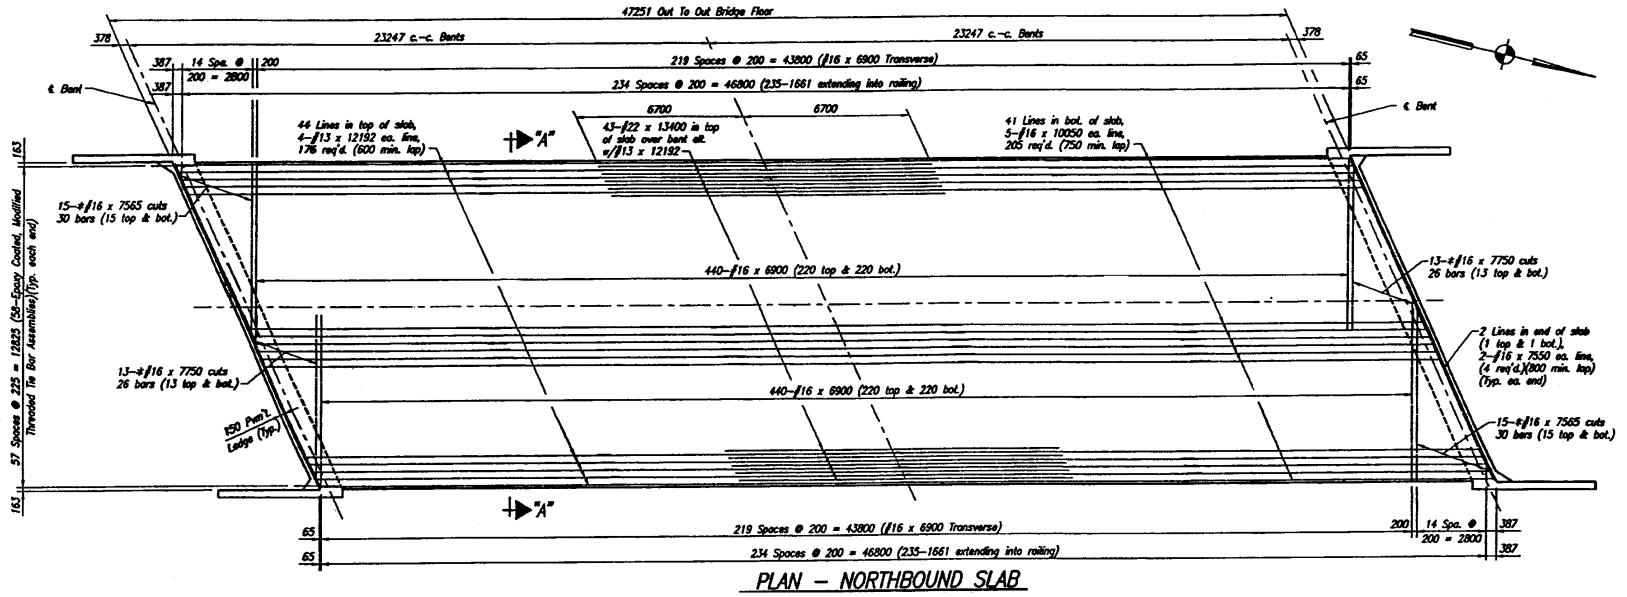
Reinforcement Layout for I65 over SR 25 Bridge
